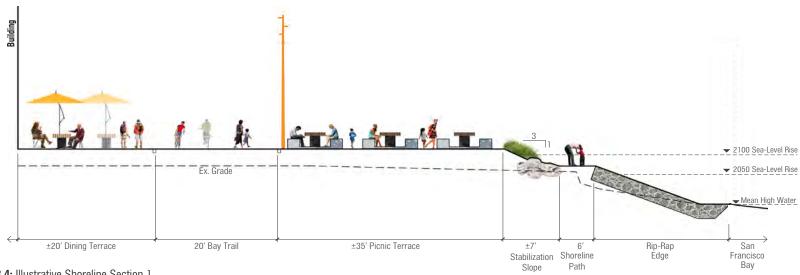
Illustrative Shoreline Section 1 Note: All dimensions and elevations are illustrative only.
